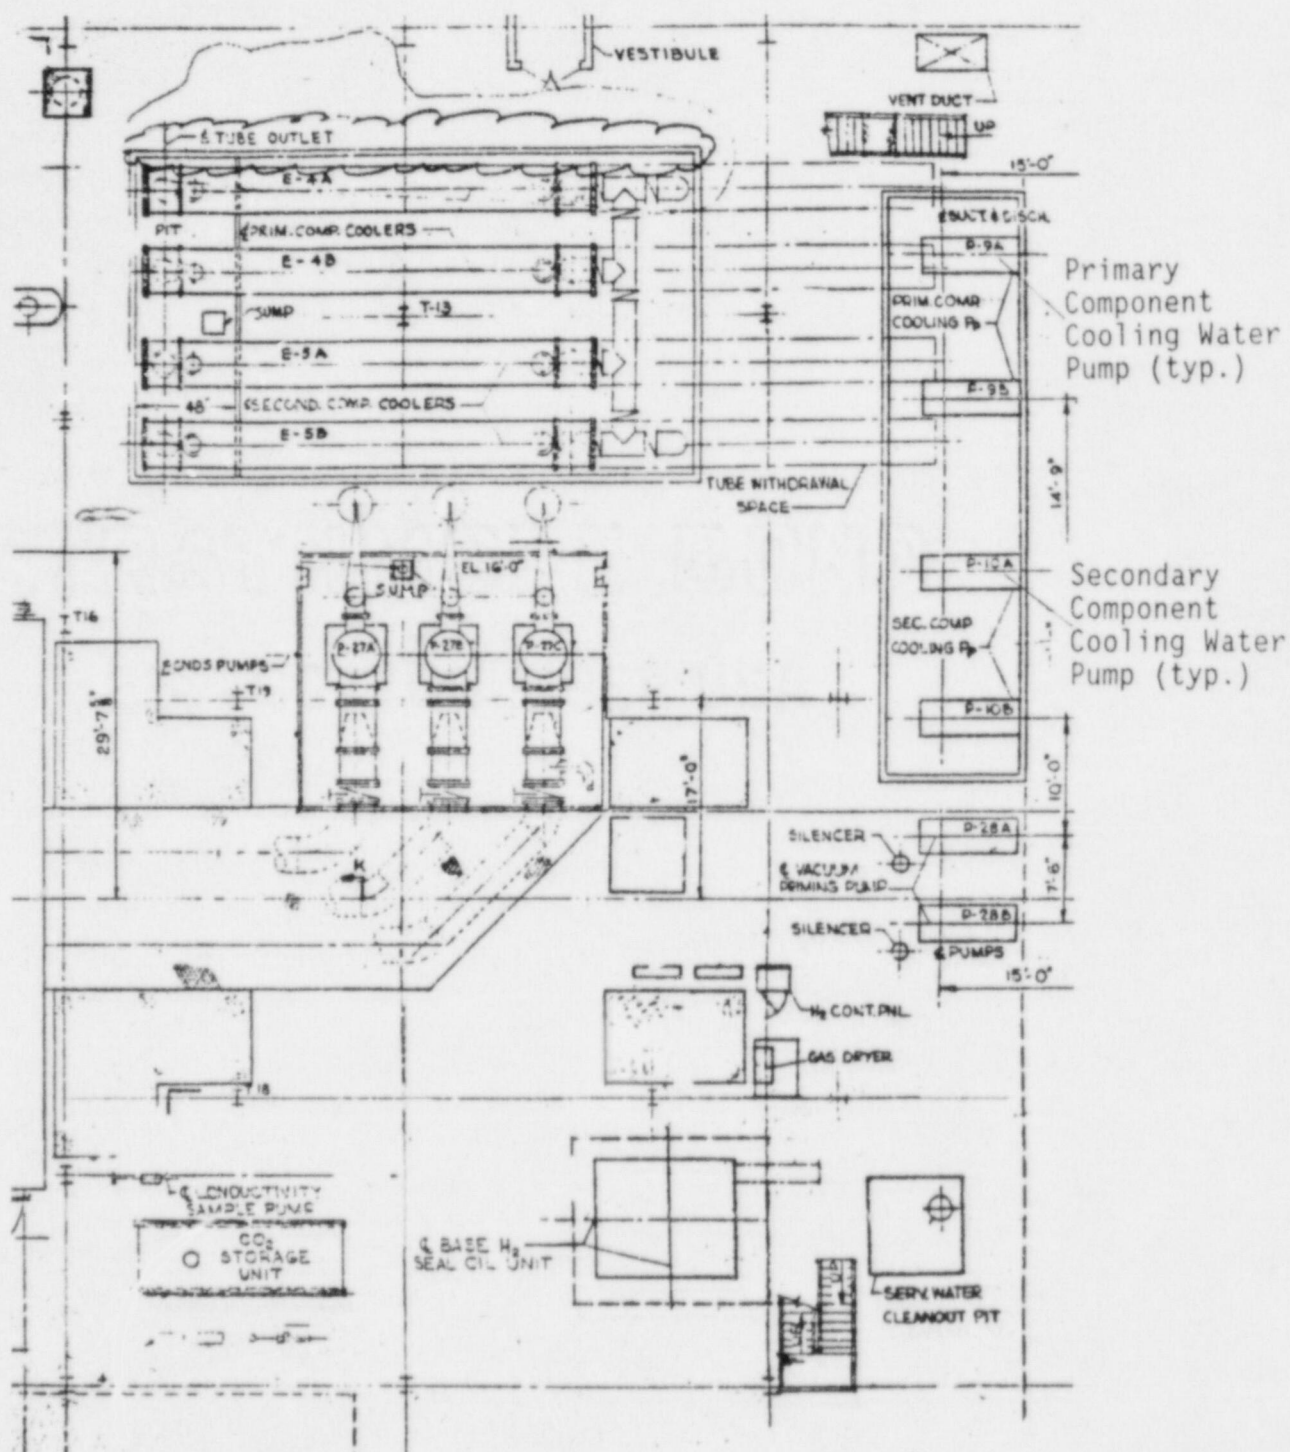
Plan of the Turbine Building Showing Critical Equipment Locations.
